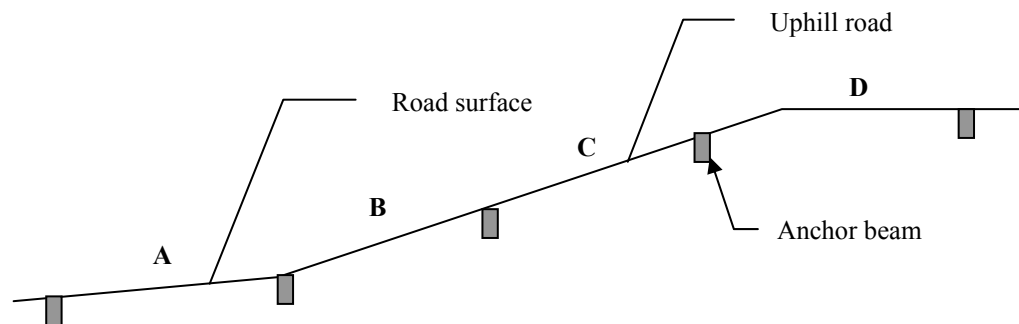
The position of anchor beams, *CMA (2000)*.
